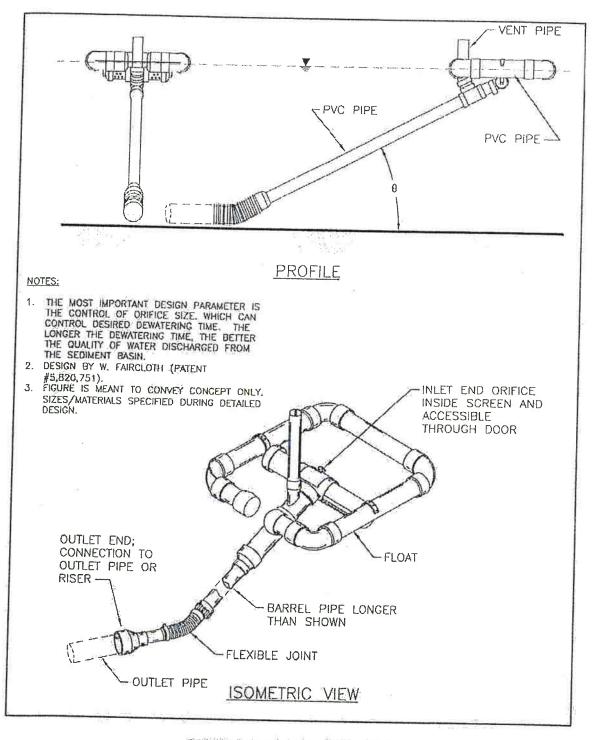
TYPICAL SKIMMER NOT TO SCALE
